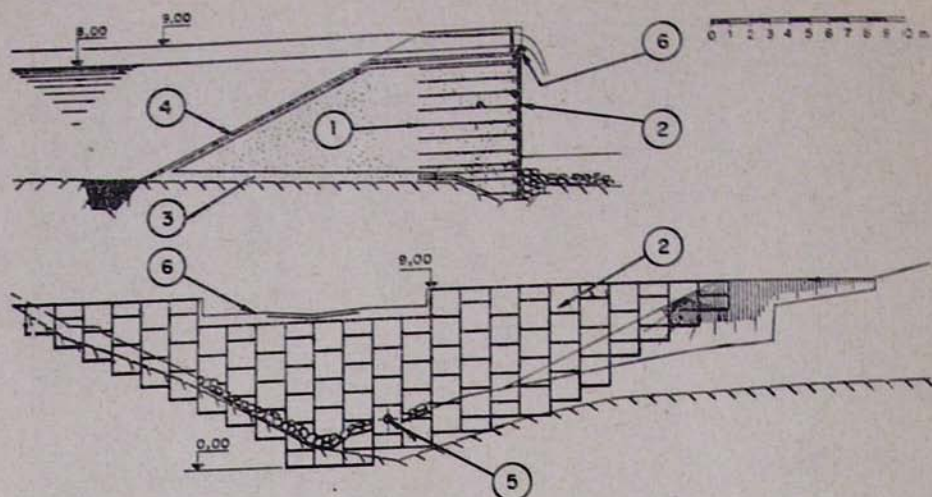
Typical section and downstream elevation of Vallon des Bimes dam; 1—Reinforcing strips; 2—Concrete scales; 3—Drainage blanket; 4—Watertight facing and lean concrete protection; 5—Bottom outlet; 6—Overflow weir.
